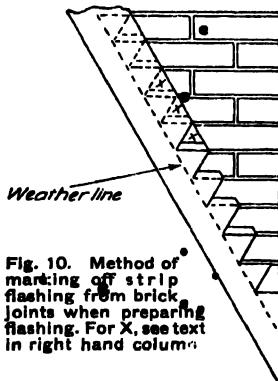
Method of marking off strip flashing from brick joints when preparing flashing. For X, see text in right hand column.
